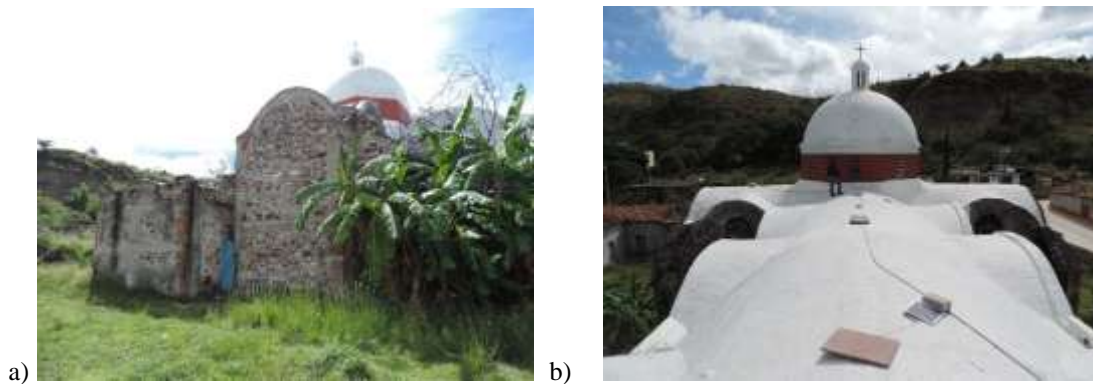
Temples of San Andrés Dinicuiti reinforced with concrete elements: a) walls and b) vault
